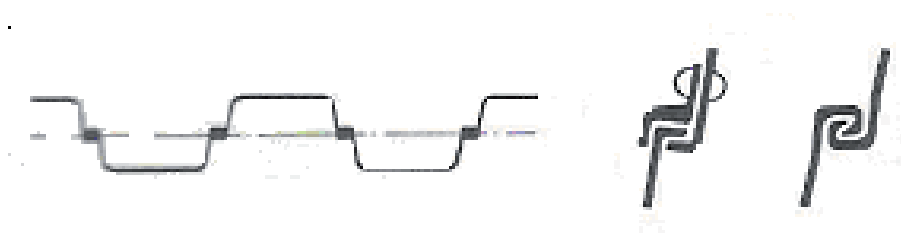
The Larssen sheet pile element with first the rivetted connection left and the welded connection right
